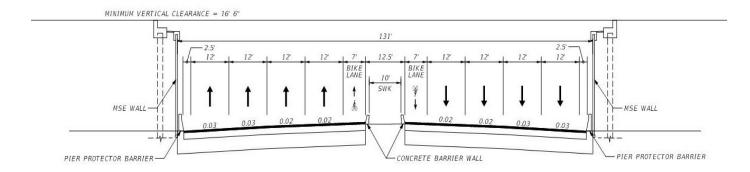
Proposed Typical Section - SR 76 / Kanner Highway between west of Jack James Drive and I-95
